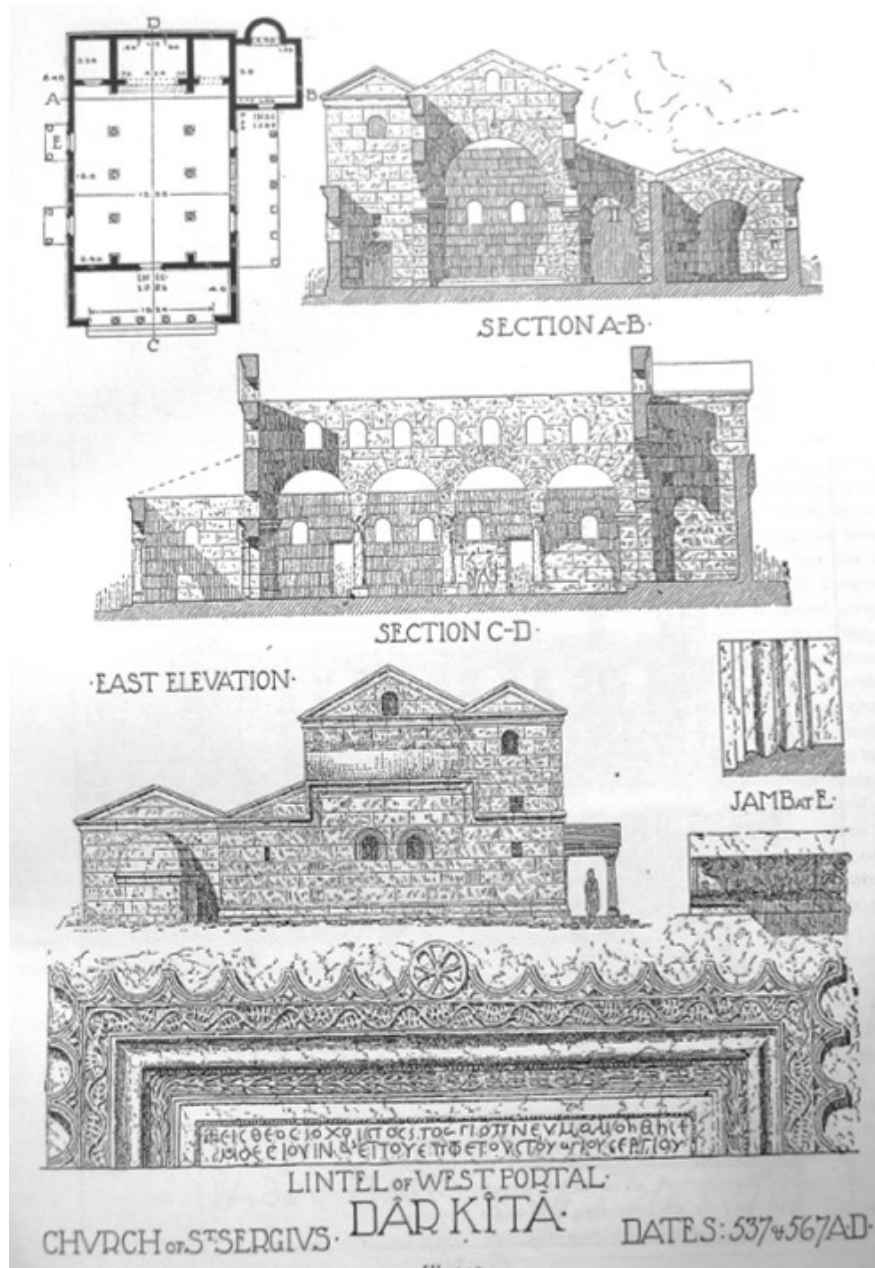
Dār Qītā plan, two sections and East façade, (*Butler, 1929, p. 137*).
